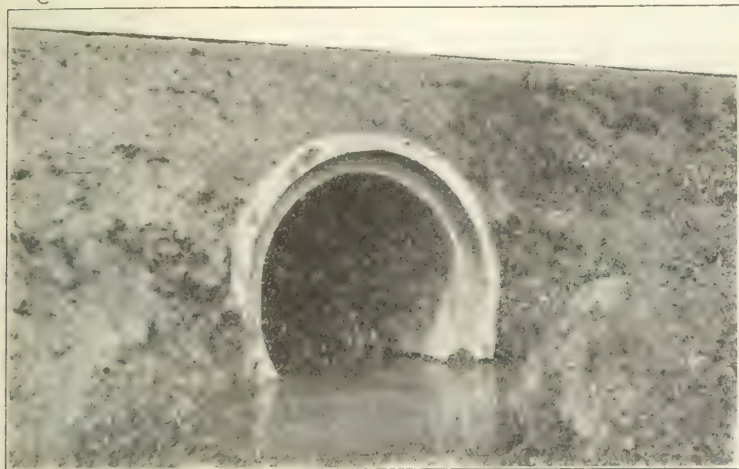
Sixty Inch Concrete Culvert replacing Wooden Box.
